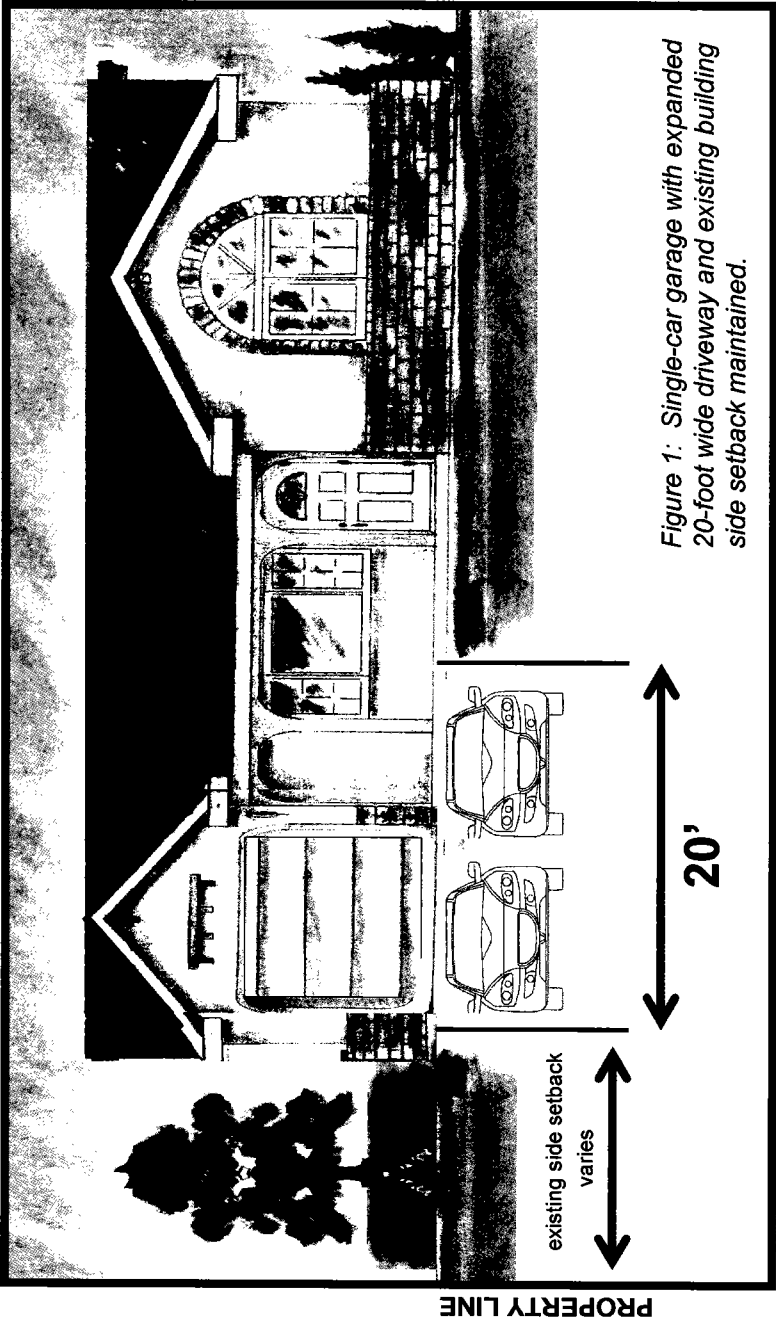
Single-car garage with expanded 20-foot wide driveway and existing building side setback maintained.
